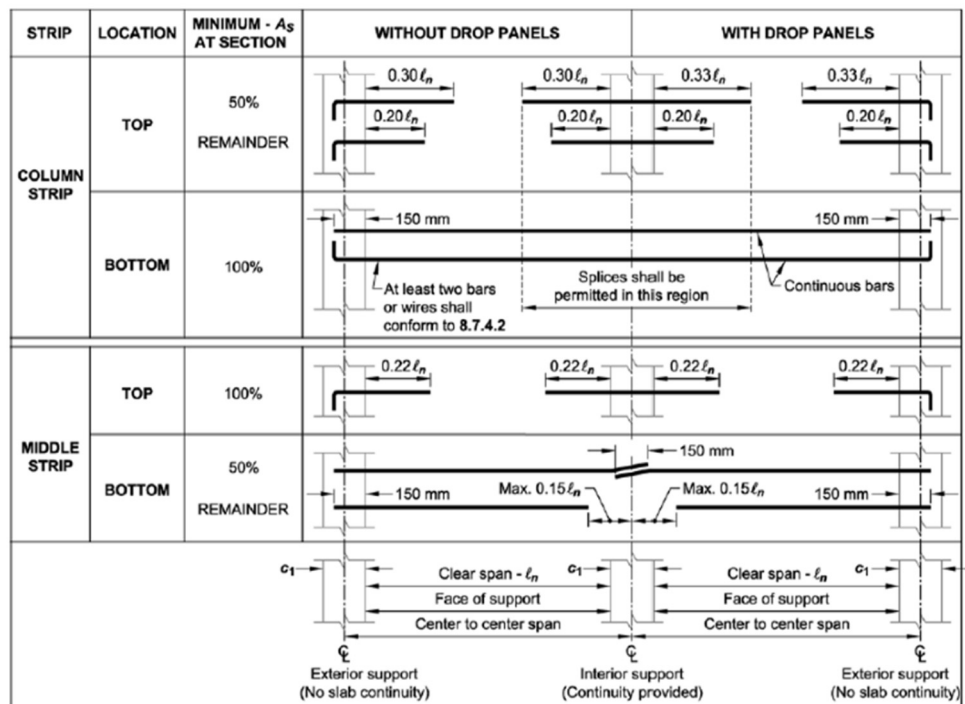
Minimum extensions for deformed reinforcement in two-way slabs without beams.
